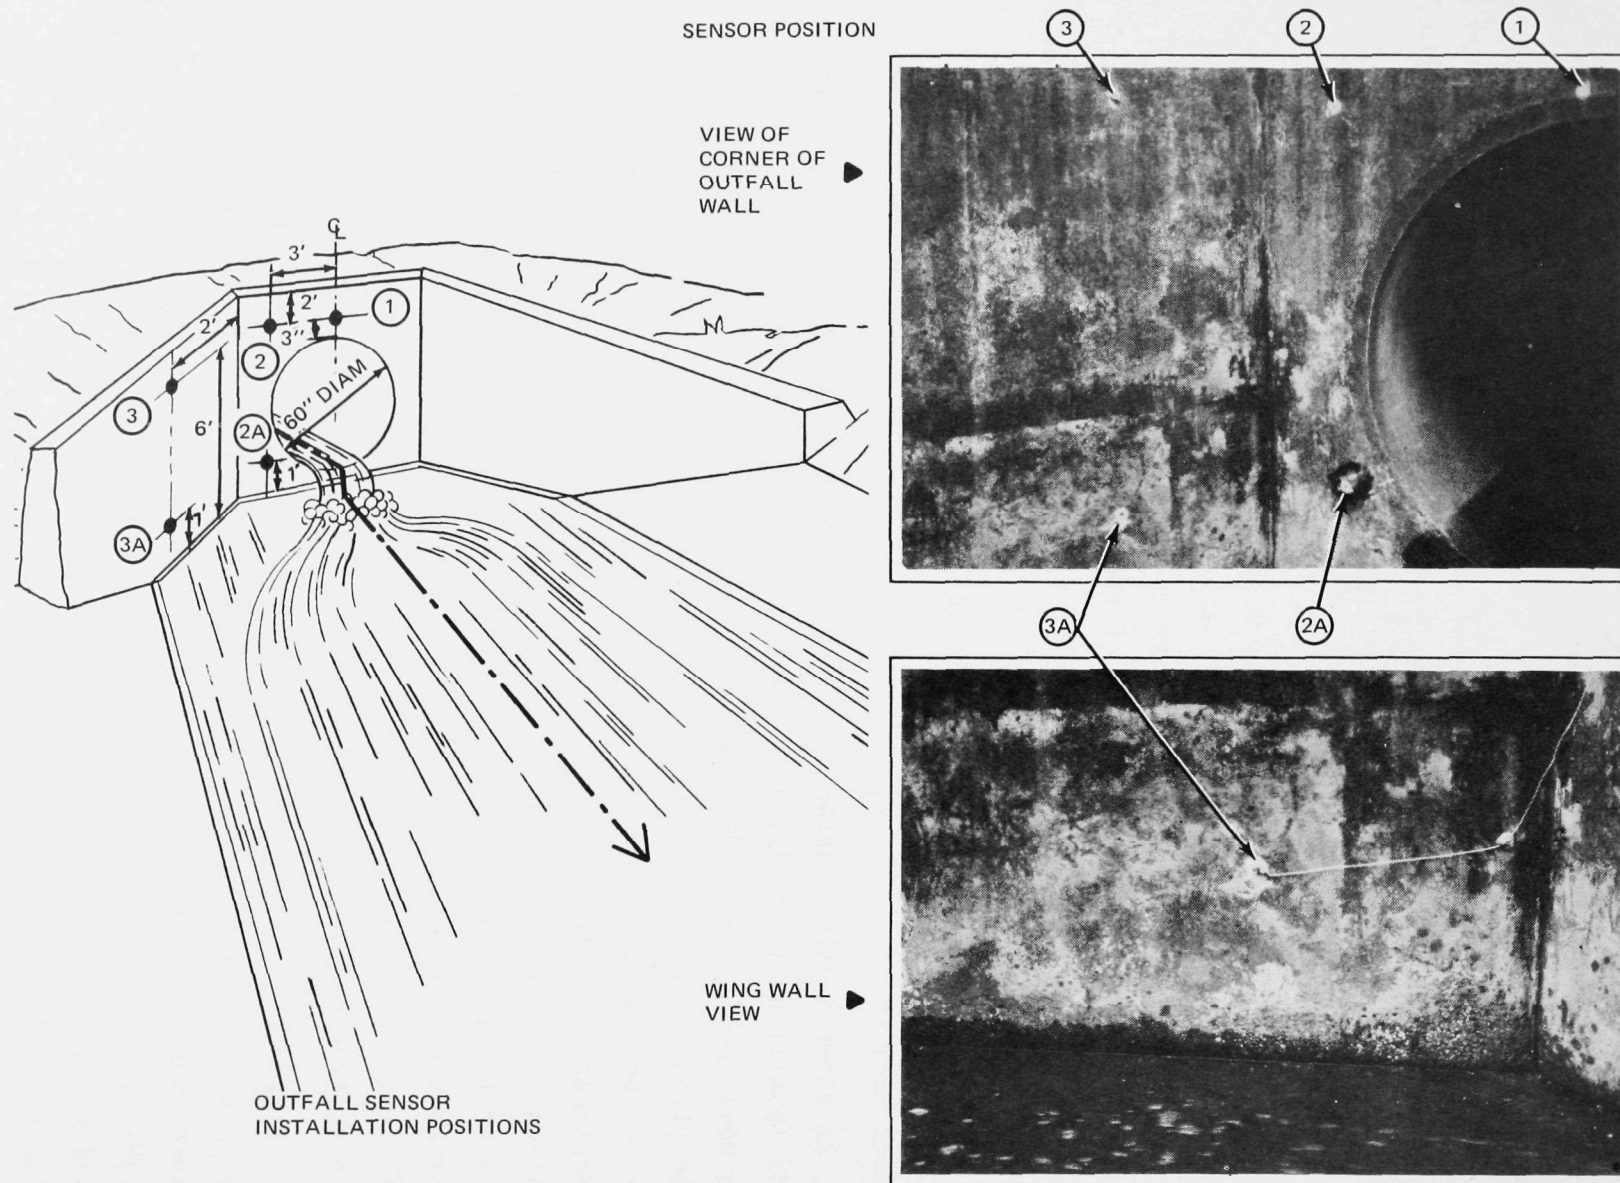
Sensor installation positions at the Cutter Mill Drain outfall.
